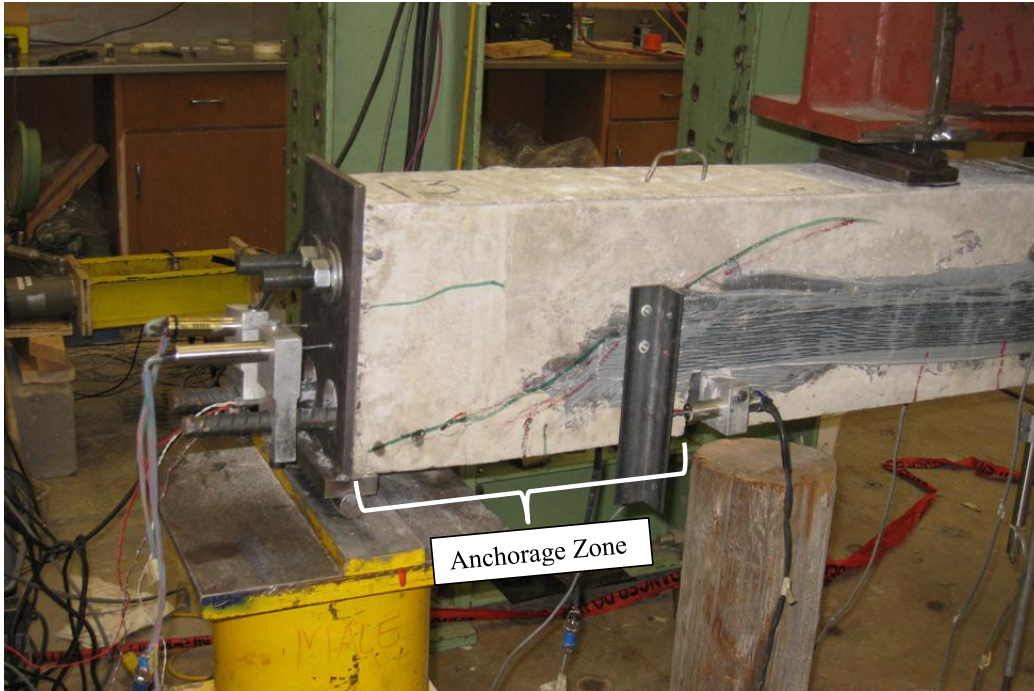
Cracks in the anchorage zone of Beam M-A*-100-0-U.
